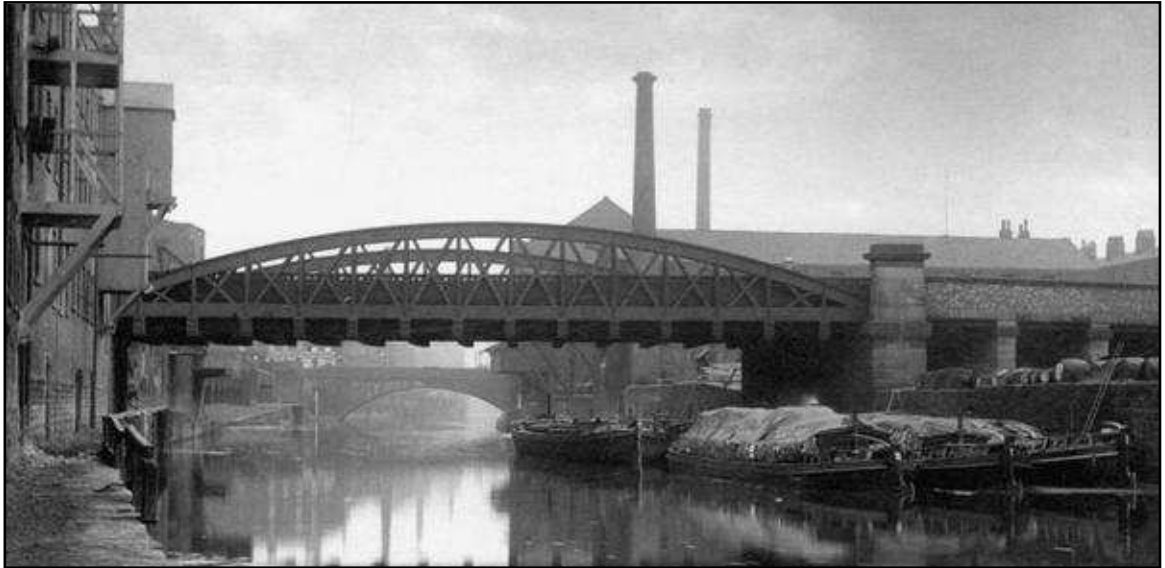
Irwell Street Bridge Manchester, looking upstream, photographed by J. Black in 1892 (Photograph courtesy of the Manchester Public Library 2007)
